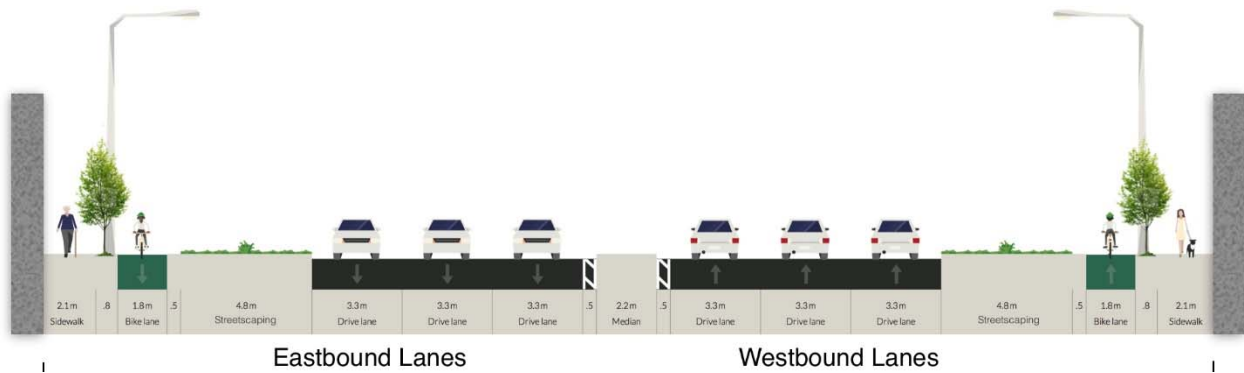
Cross-Section of Steeles Avenue East at the Rail Corridor
